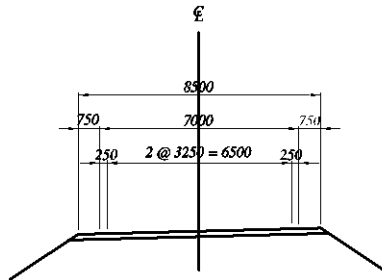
Typical Cross Section for Ramp (Temporary 2-lane, Earth Work)
